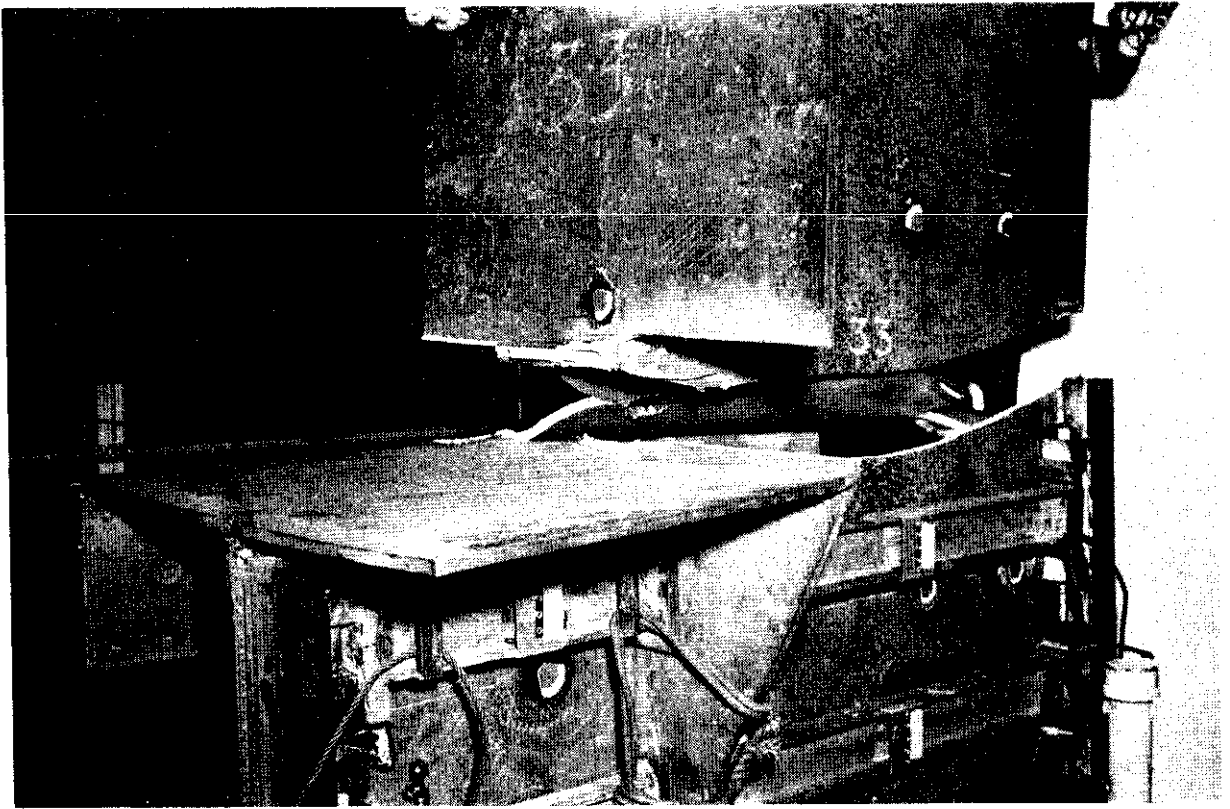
Specimen 33: View of fractures from above deck and inboard
